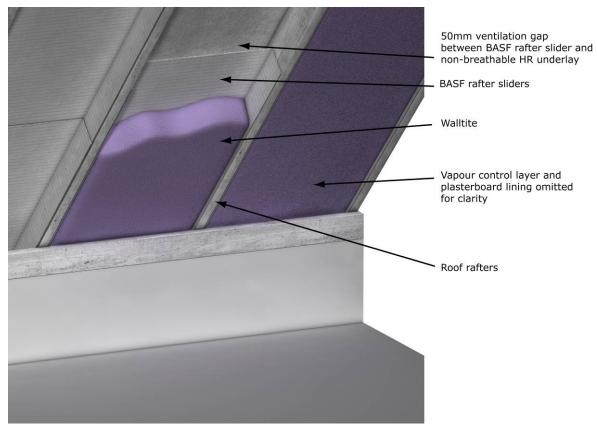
Pitched Roof Construction: non-breathable HR underlay
